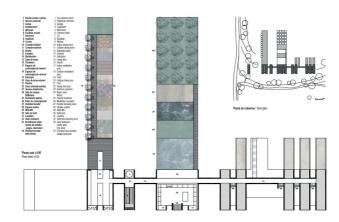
Ground floor plan , Horizon house, RCR architects (2007) • Source: El Croquis
